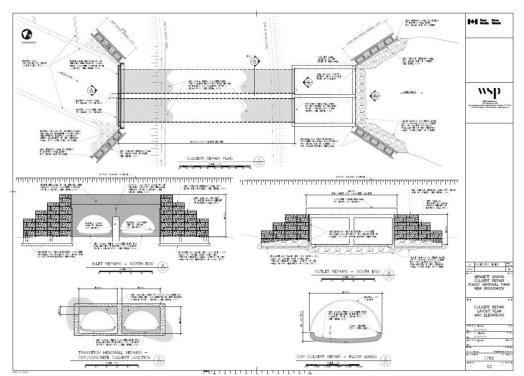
Plan and Elevations layout of Culvert Repair (WSP/Parks Canada - Digital Files).
